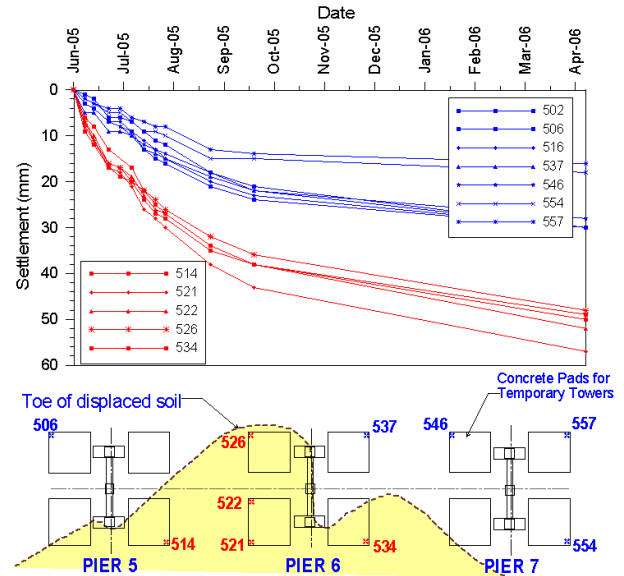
Time vs. settlement plots of the temporary tower concrete pads, and location plan
